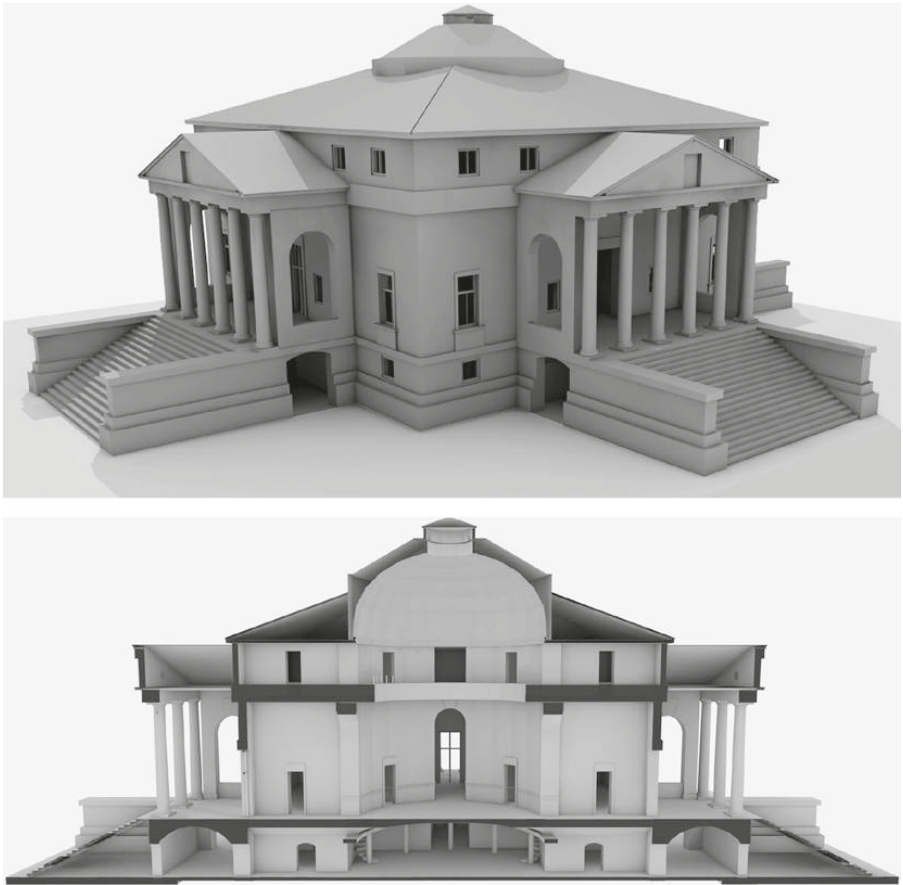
Palladio. Villa Rotonda. Drawings by Athina Lazaridou
